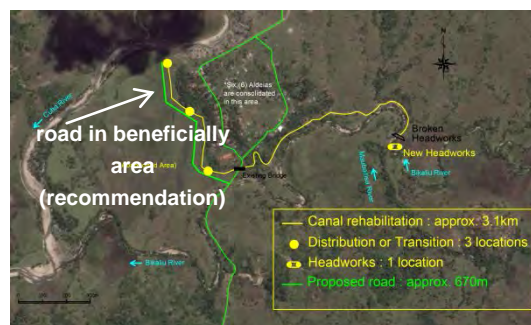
Road Plan for Recommendation in the Beneficiary Area
